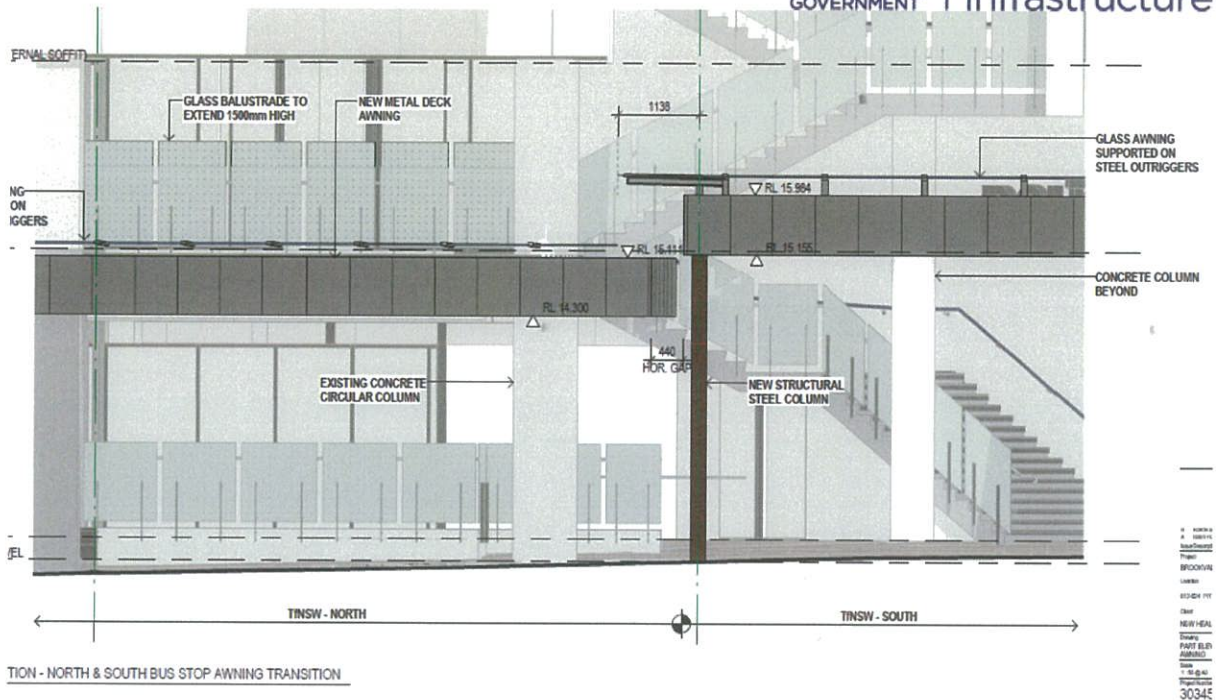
Proposed extension of North and South TfNSW Awning across breezeway
